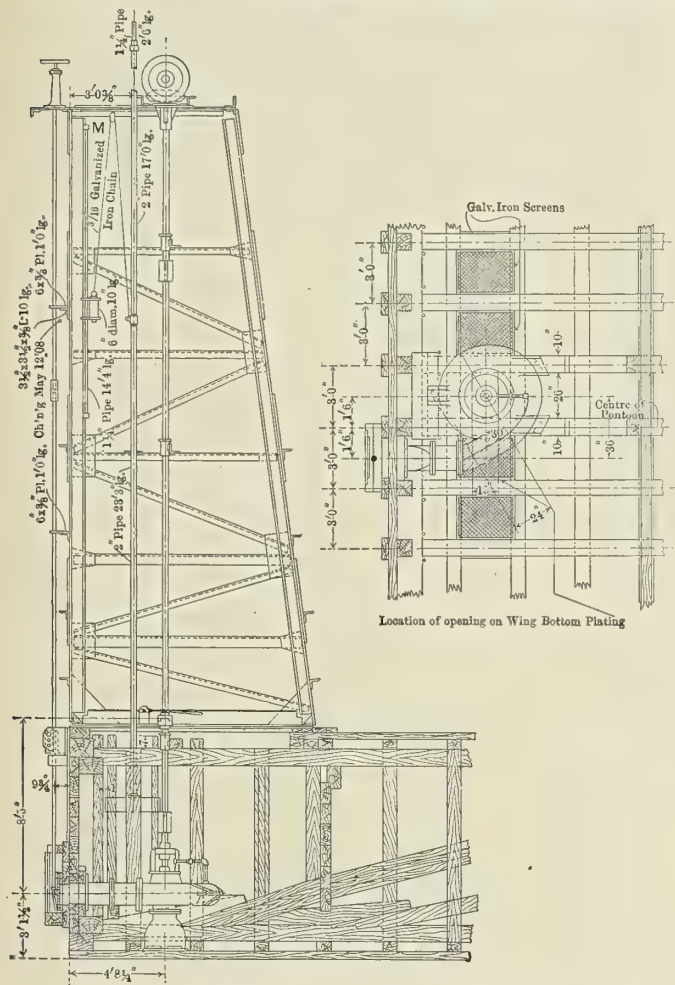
SECTION OF WINGS, SHOWING LOCATION OF PUMP.
